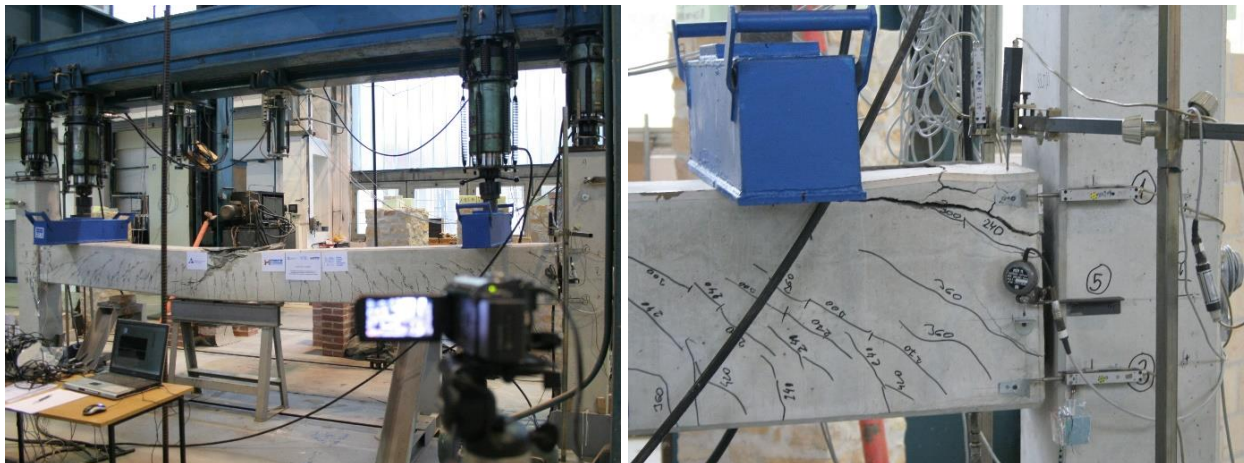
Test configuration (on the left), crack formation on the upper edge of the girder (on the right)
